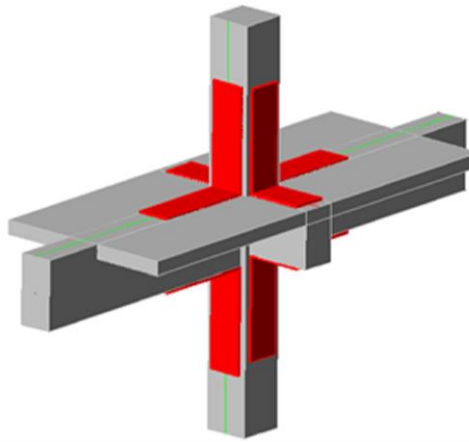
L-shaped column retrofit typically used in China (Yu et al., 2016).
